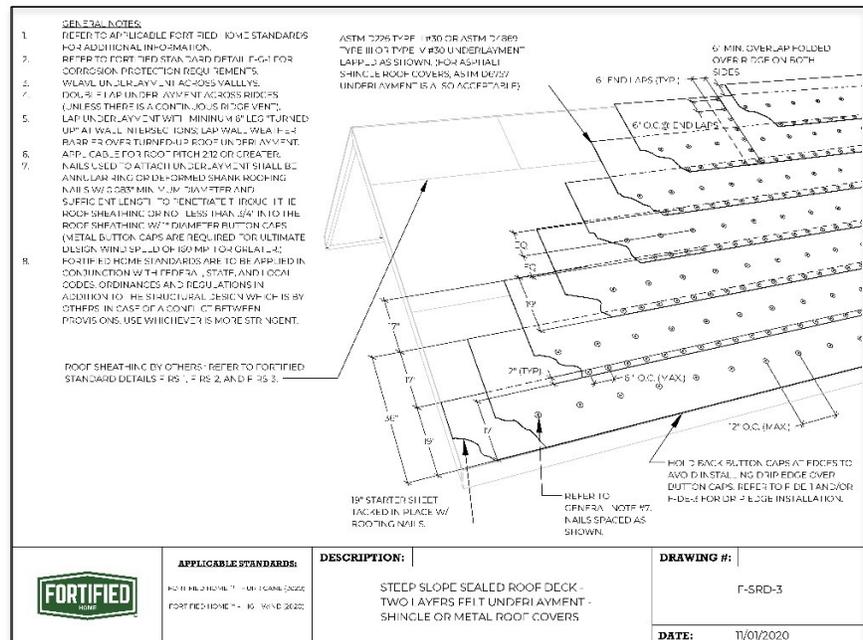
Two-Ply Felt Underlayment SRD Method – [FORTIFIED Standard Detail F-SRD-3](#)
